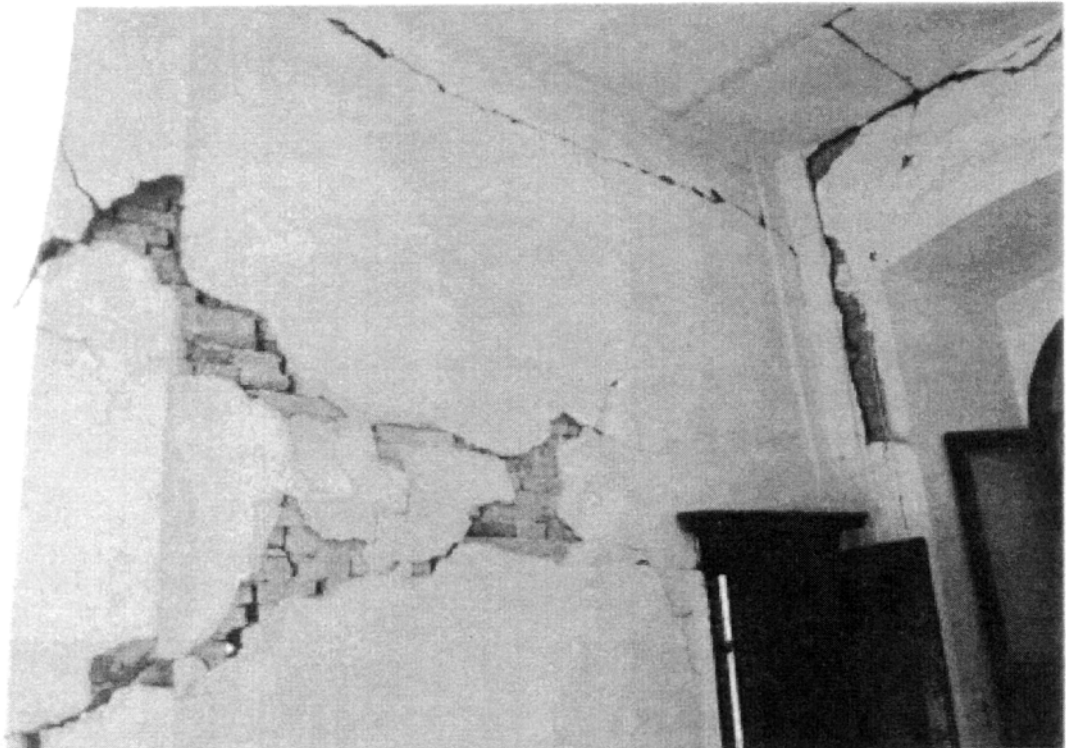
Santa Chiara Convent: an internal bearing wall with shear cracks and buckling collapse at the wall junction
